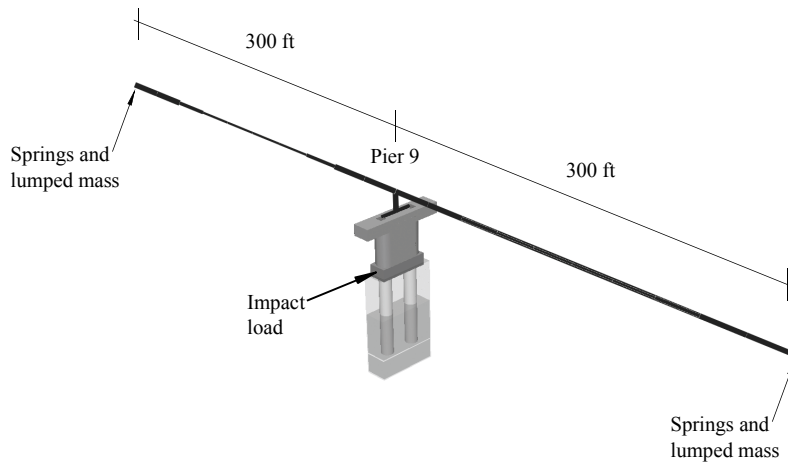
John Ringling Causeway, Pier 9 (RNG-OFF) OPTS model
